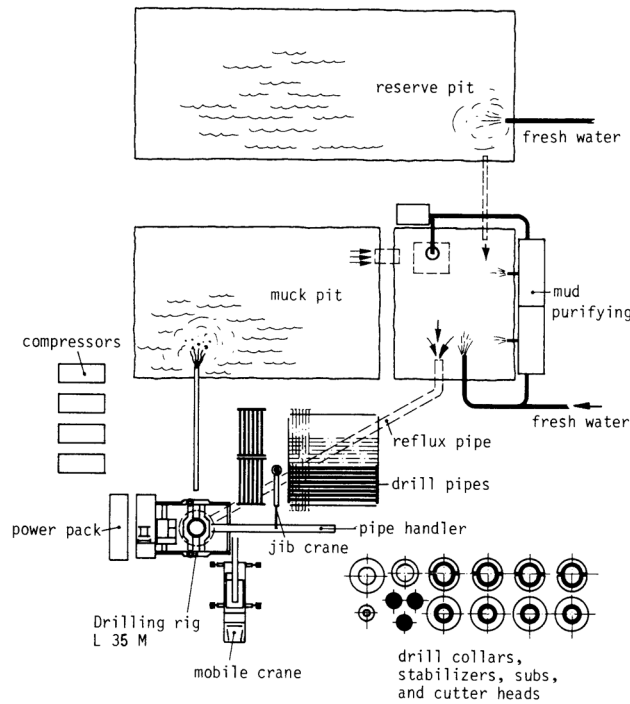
typical arrangement of job site equipment for L 35 M-installations
